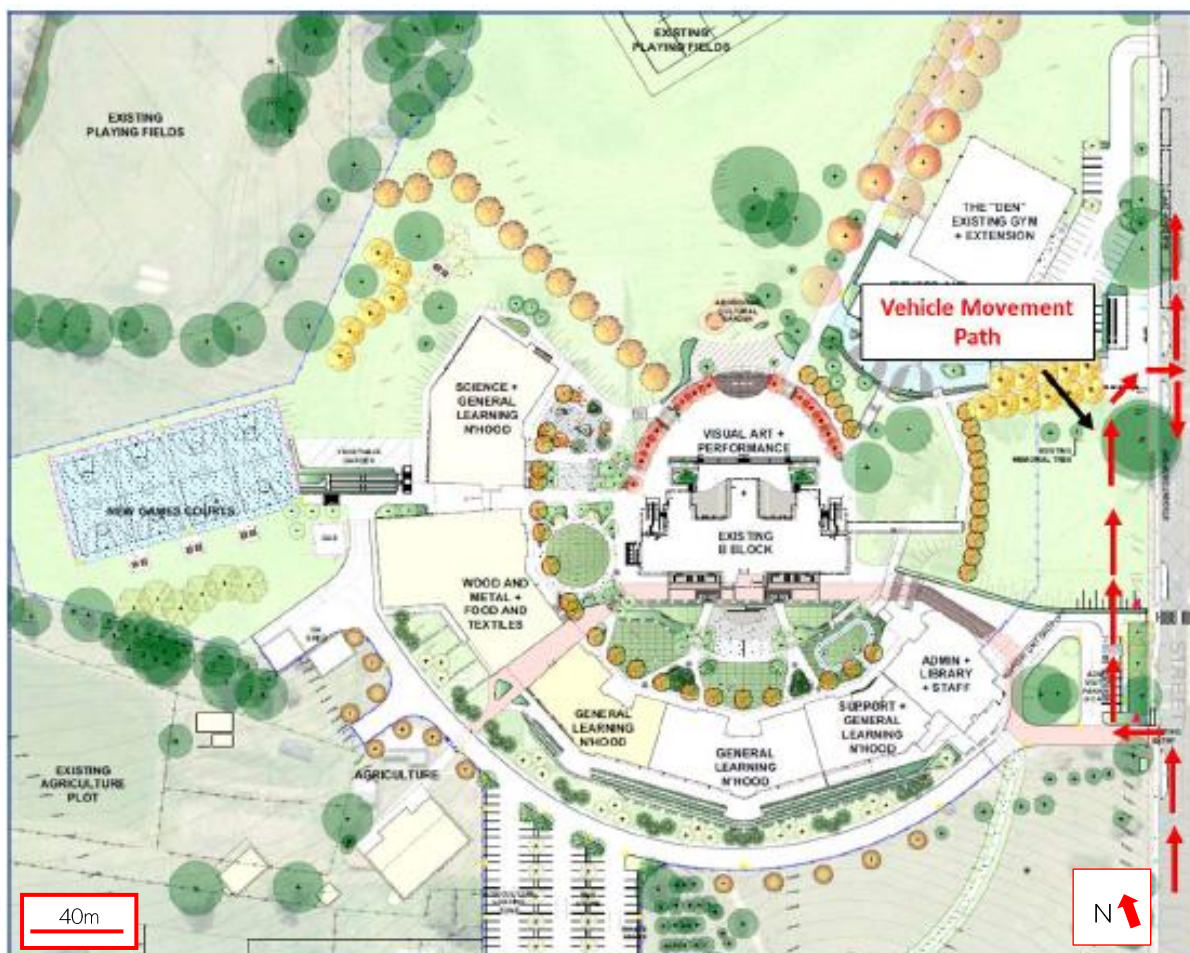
| Proposed construction vehicle movement plan through the site (Source: EIS, 2018)
